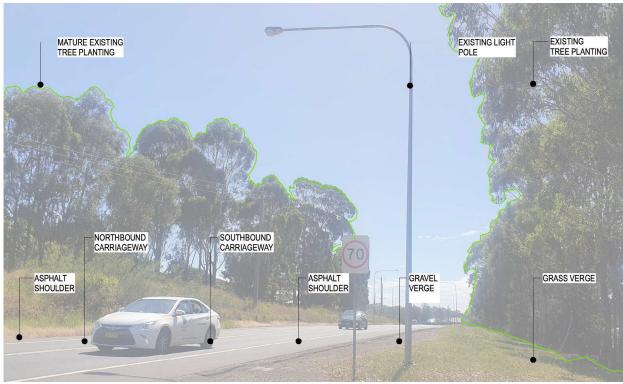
Viewpoint 1 - The Northern Road near Livvi's Park (facing north east) - Existing view
